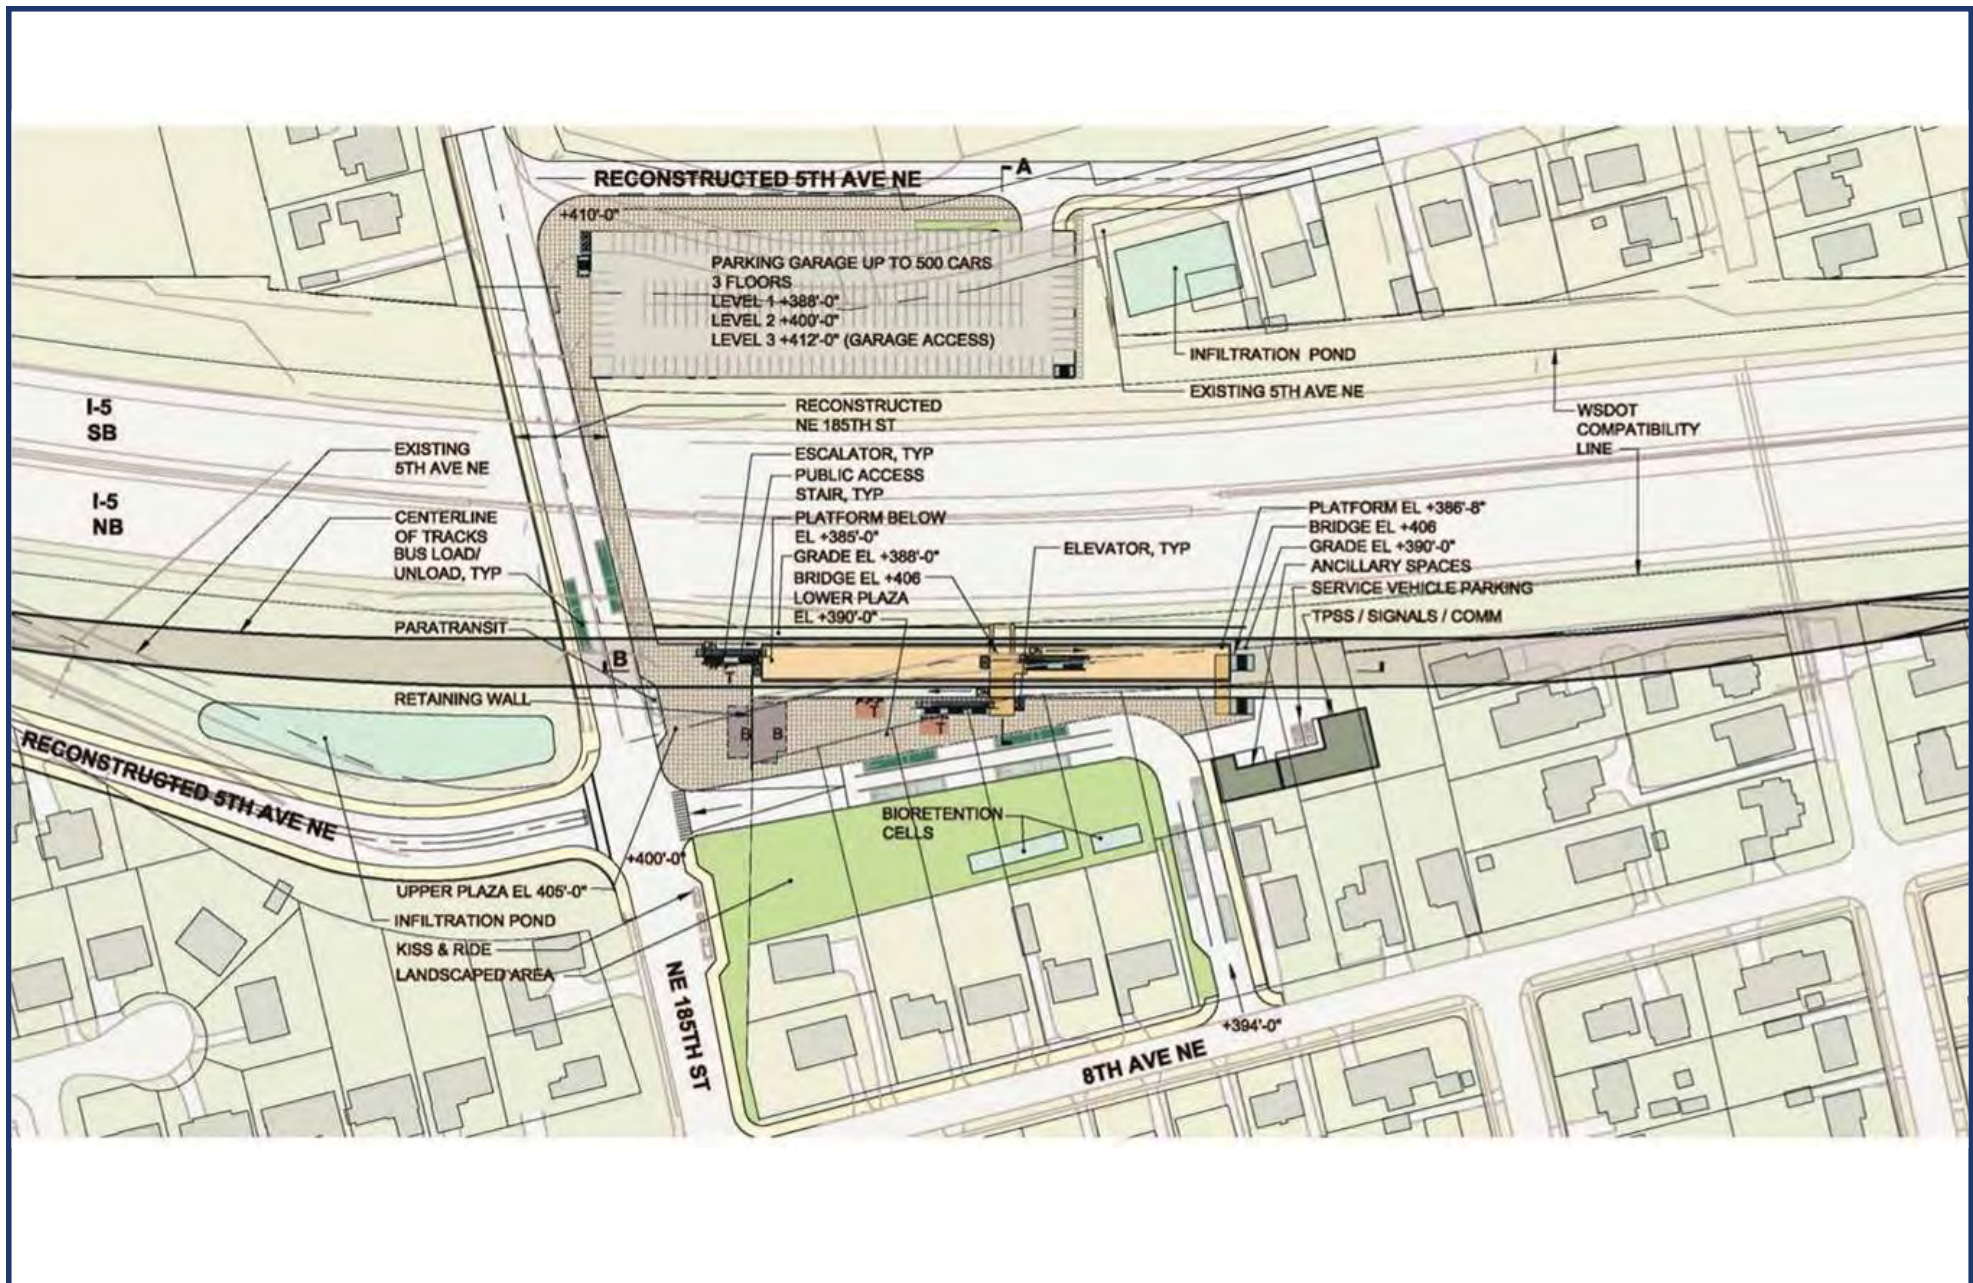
Sound Transit Concept Plan for the 185th Light Rail Station
